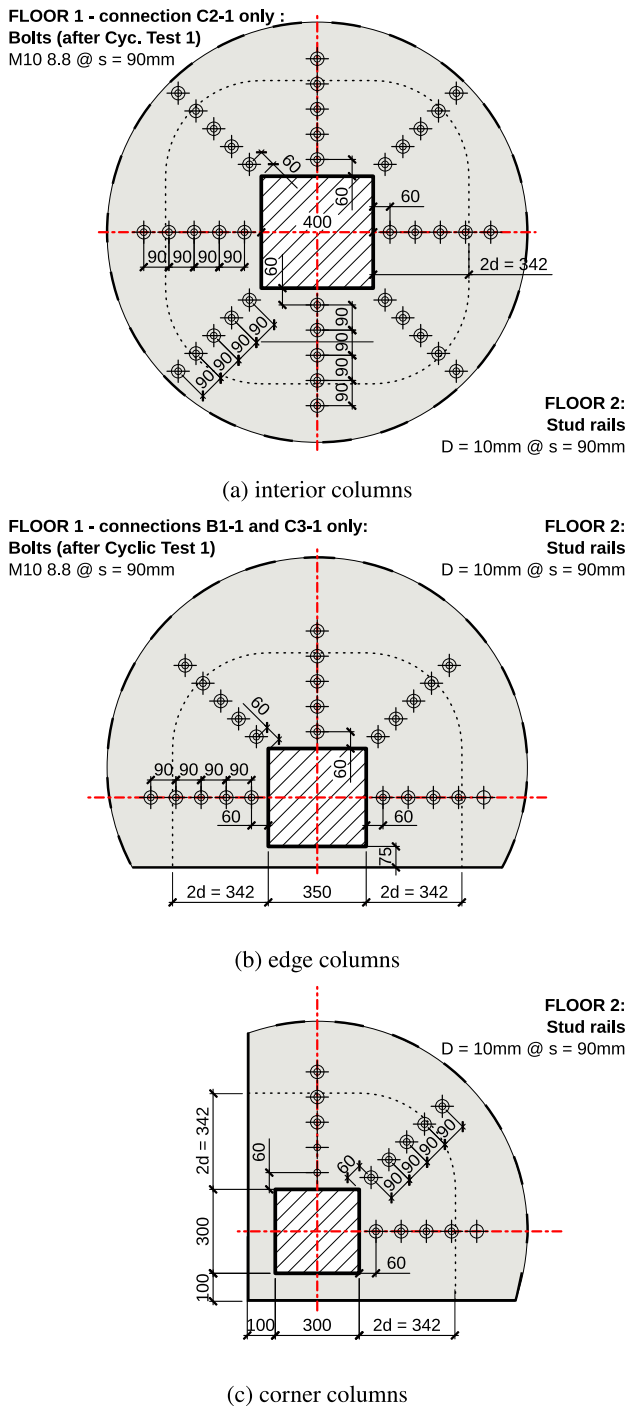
Layout of punching shear reinforcement of slab-column connections at the second floor (stud rails $d = 10 \text{ mm} @ 90 \text{ mm}$) and at first floor after test CYC-1 (bolts M10 8.8); d is the mean effective depth of the slab.
